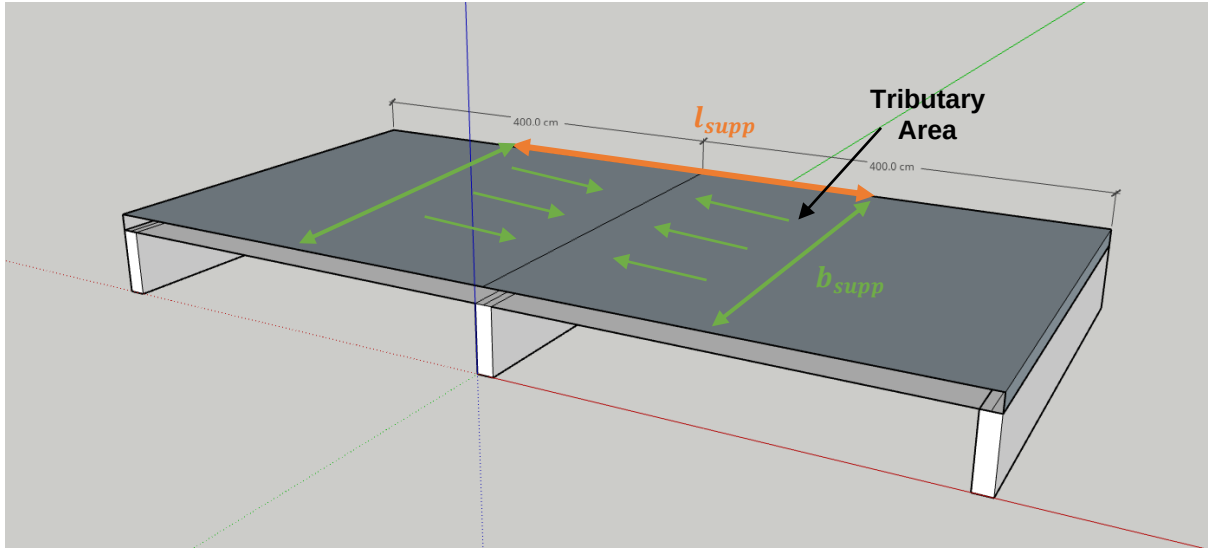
3D image of analysed 4m RC beam (middle beam) supporting a 150mm one-way spanning slab
